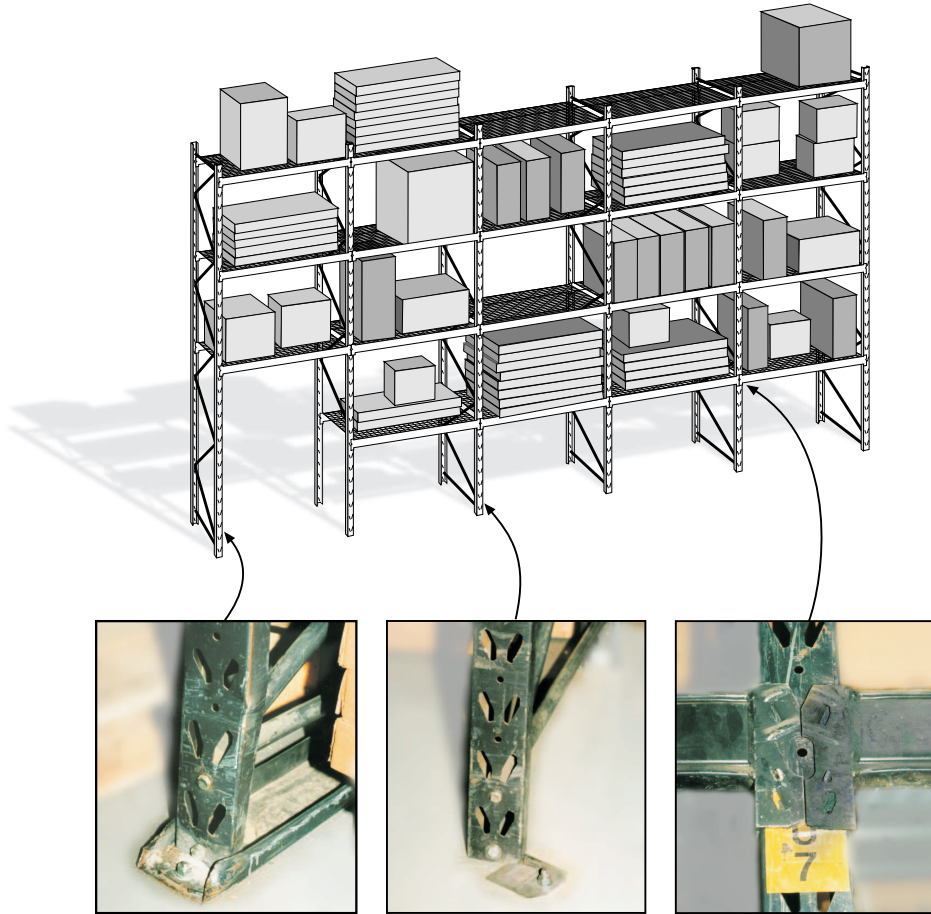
A typical pallet rack used in industry. Damaged columns and floor connectors are highlighted, as well as a beam-column connector.
